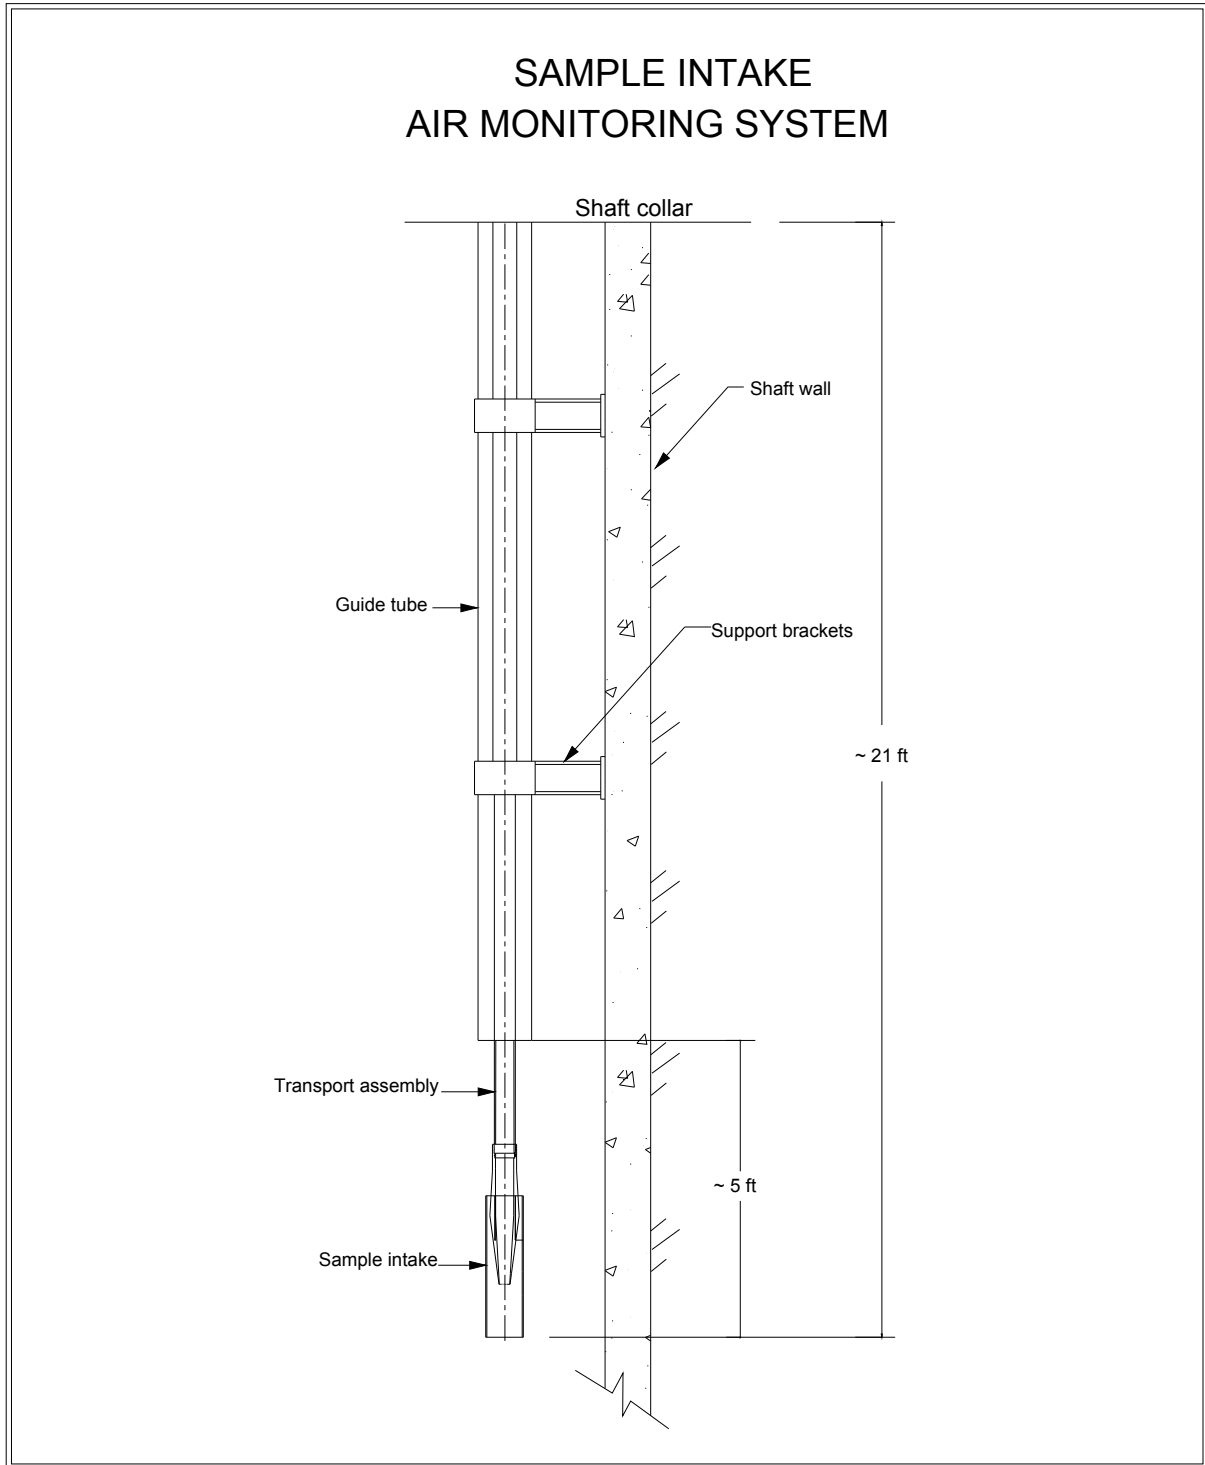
Sample Intake of Exhaust Shaft Air Monitoring System
